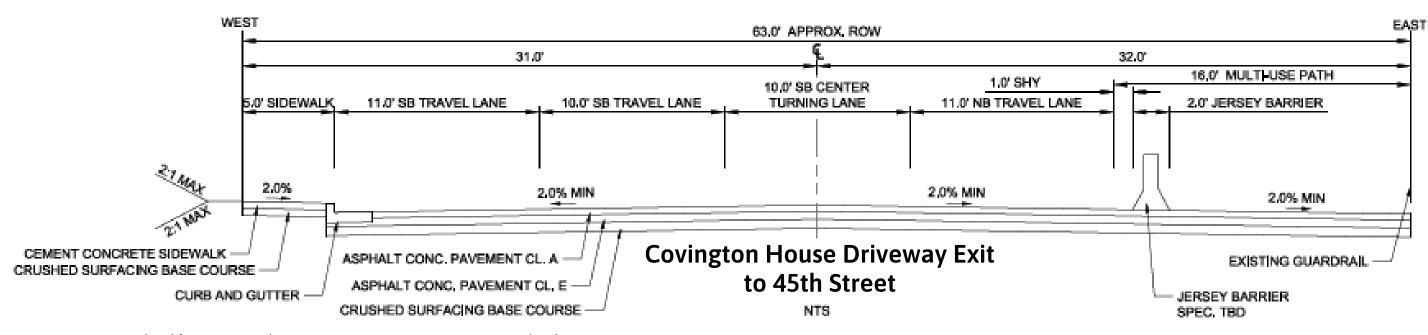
Cross section detail for Main Street between Covington House Driveway Exit and 45th Street
